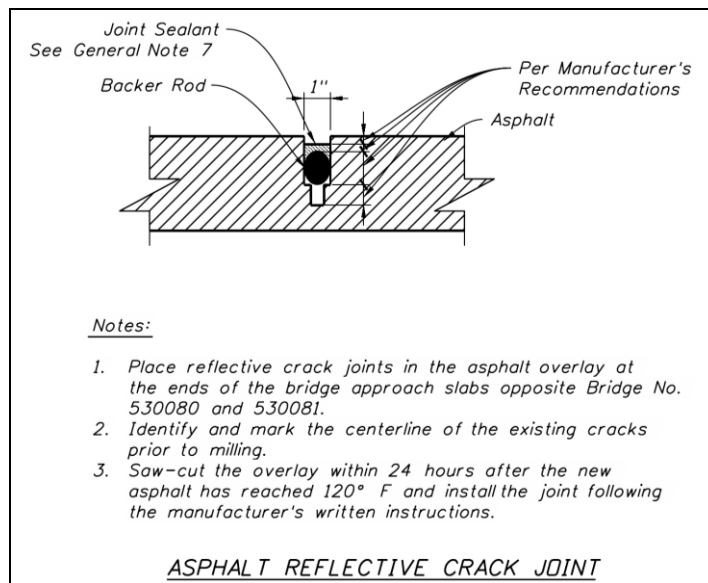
Asphalt Reflective Crack Joint Details
